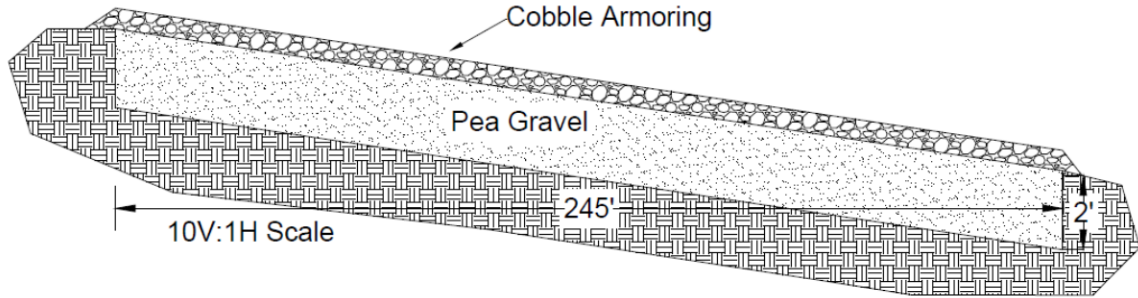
Longitudinal cross-section for example horizontal filter trench in WS 2
